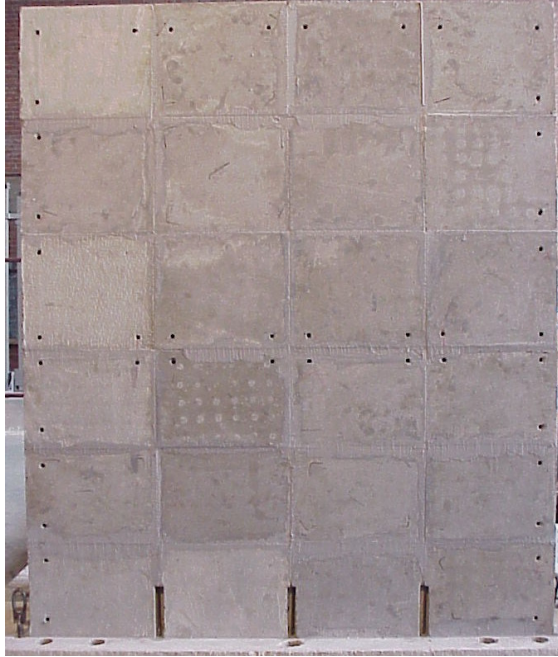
Specimen CEE4 before filling the gaps between the adjacent panels around the anchorage bars with epoxy mortar and placing $\phi 8$ bolts
